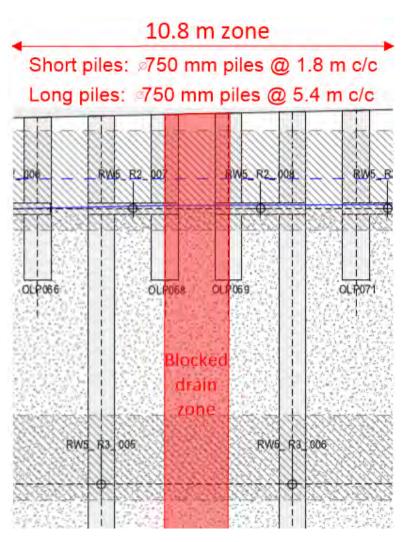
TYPICAL PILE LAYOUT AND BLOCKED DRAINAGE ZONE
